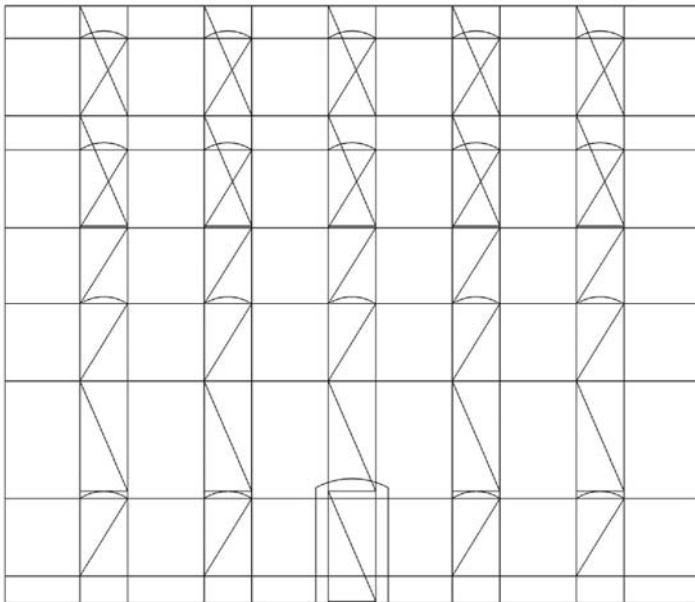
Proportion analysis of historic building shell's façade.
